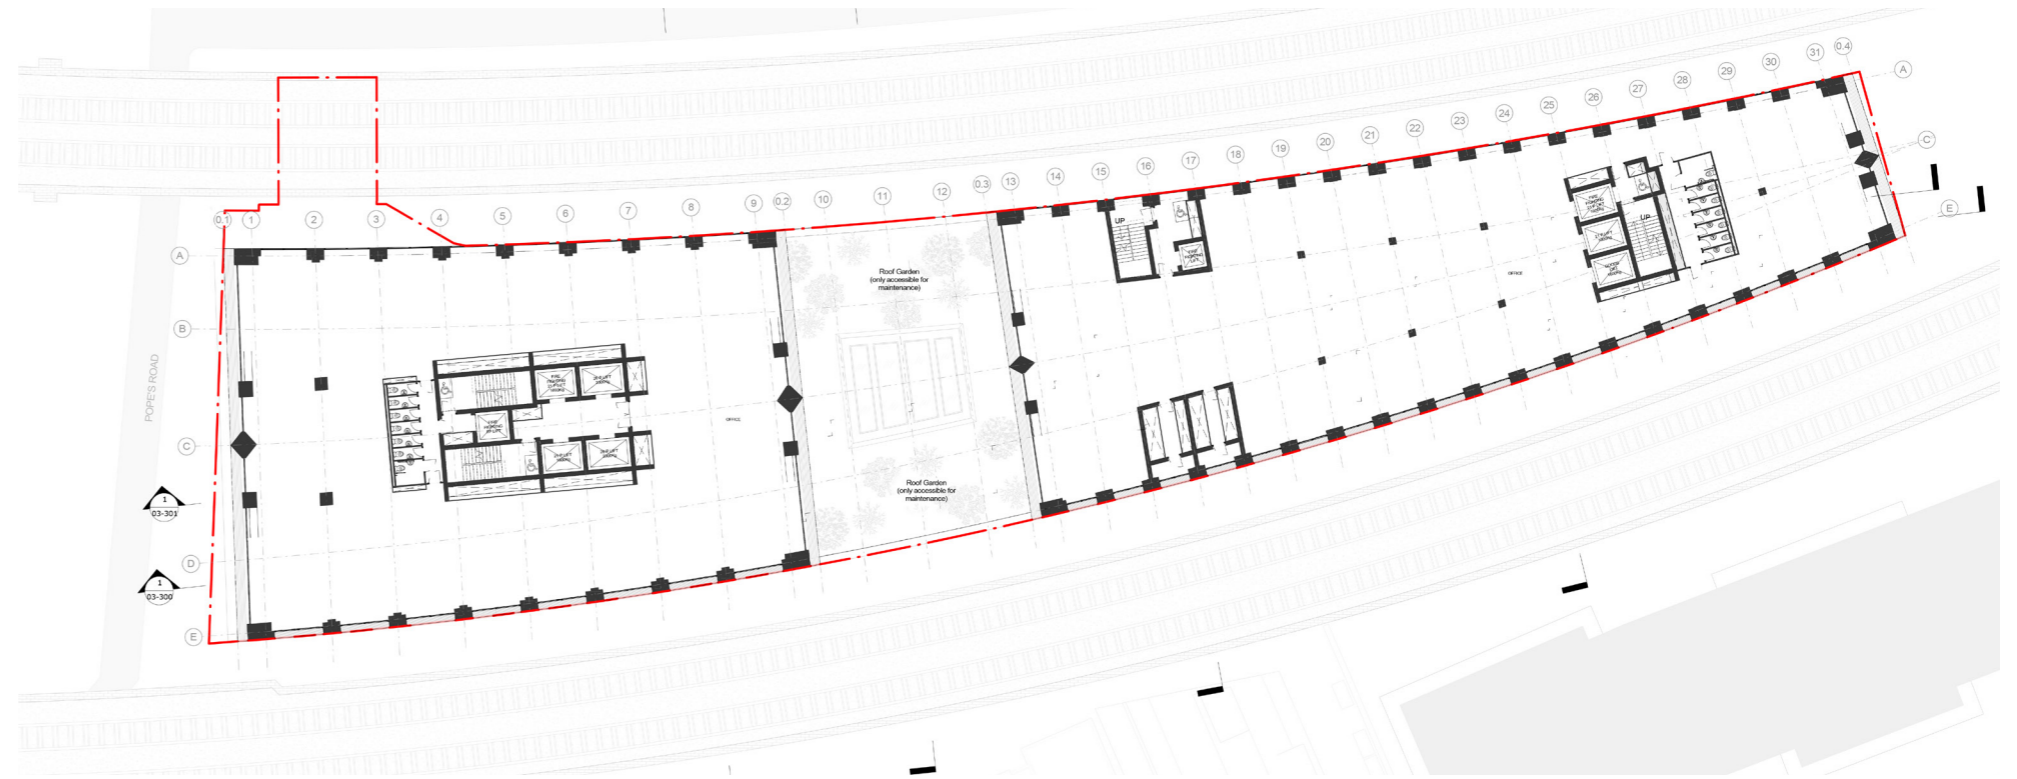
March 2020 Planning Application typical office floor plan
